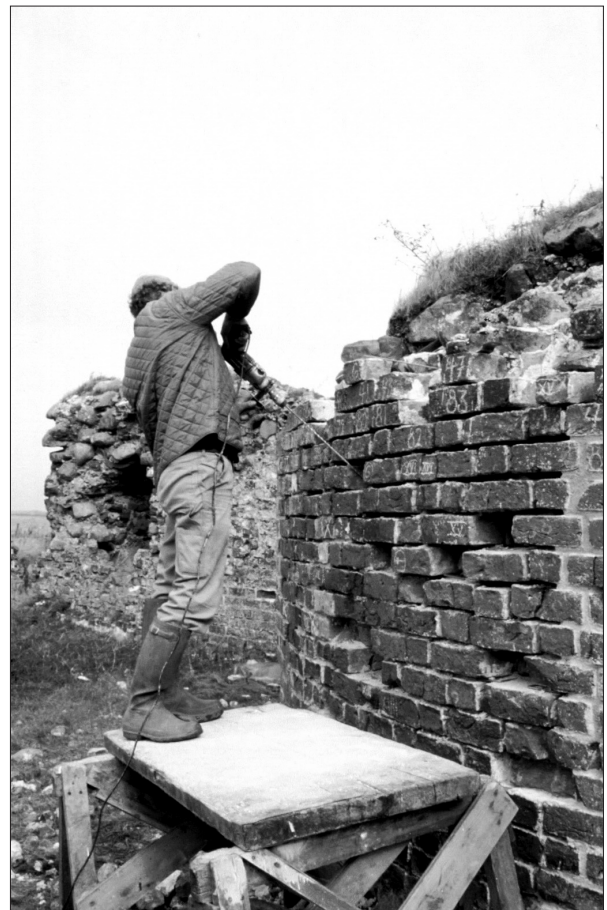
The master mason Johan Henriksen drilling in the wall core to mount the masonry anchors. The masonry anchors fix the original facade wall to the wall core. The facade bricks are numbered, so that bricks that have been removed can be reinstalled in their original places. Photo: J. Frandsen, The National Museum.
